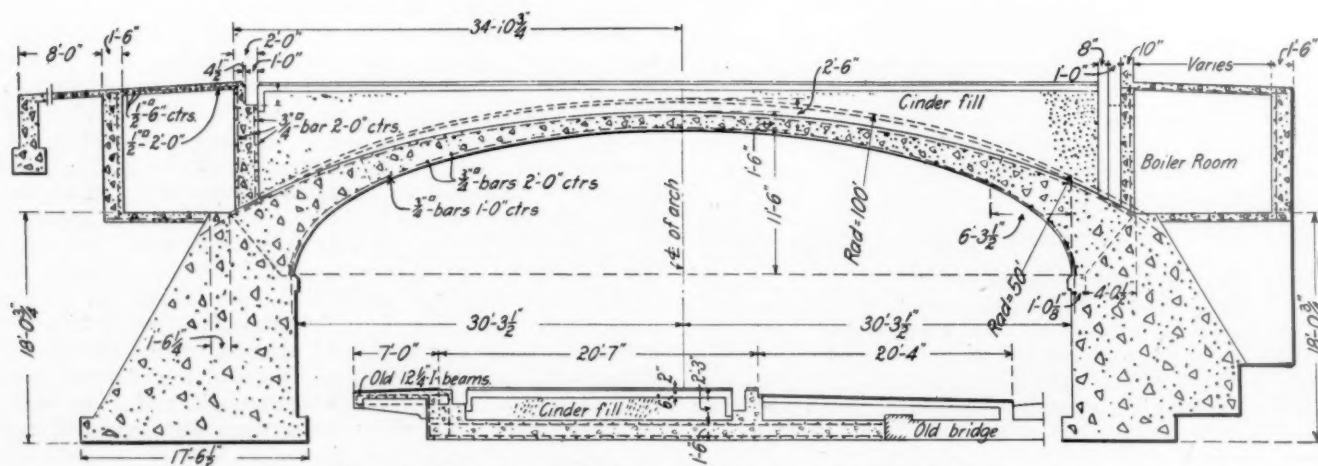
Sixty-foot Arch Over the Tracks at Kingsland, N. J.
